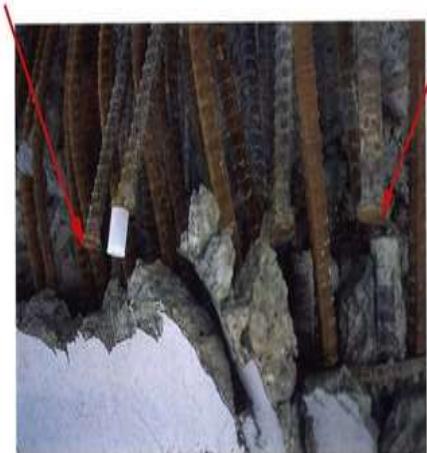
Failure of "gas-pressure welded" splices in a bridge pier.
